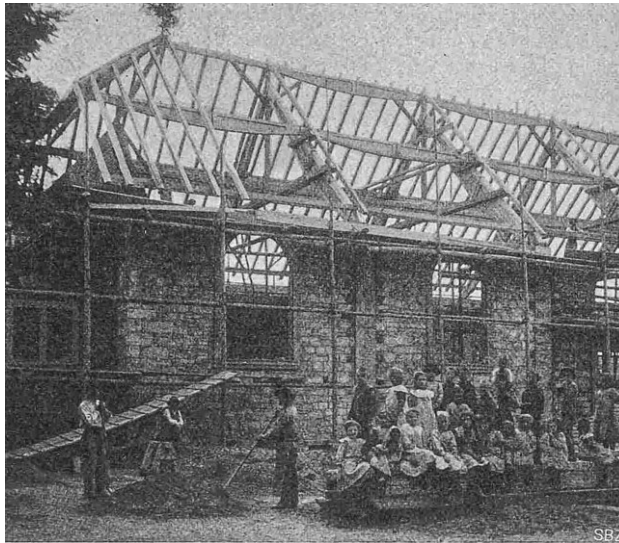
Construction site of the sports hall Birsfelden, 1911.
